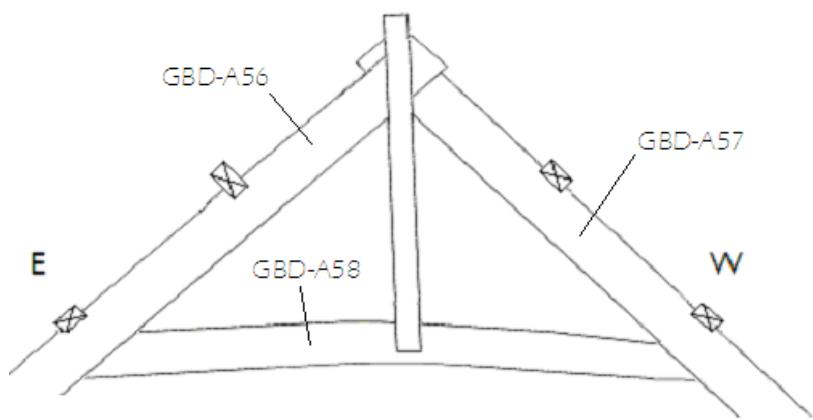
West range; sketch of truss 1, showing the location of samples GBD-A56–8
